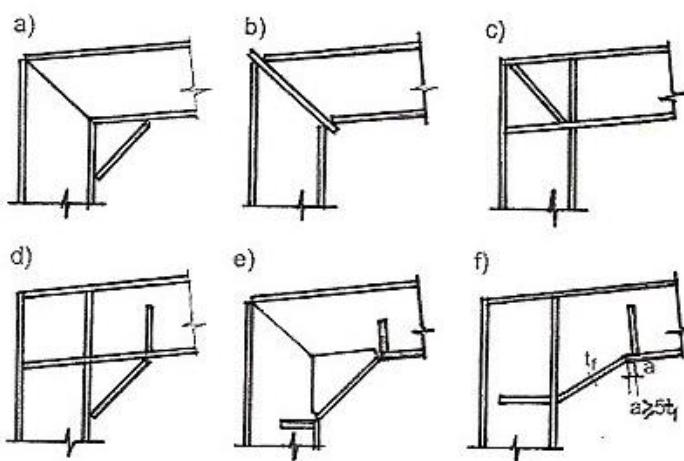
Examples of shop welded haunches in small-span frames
